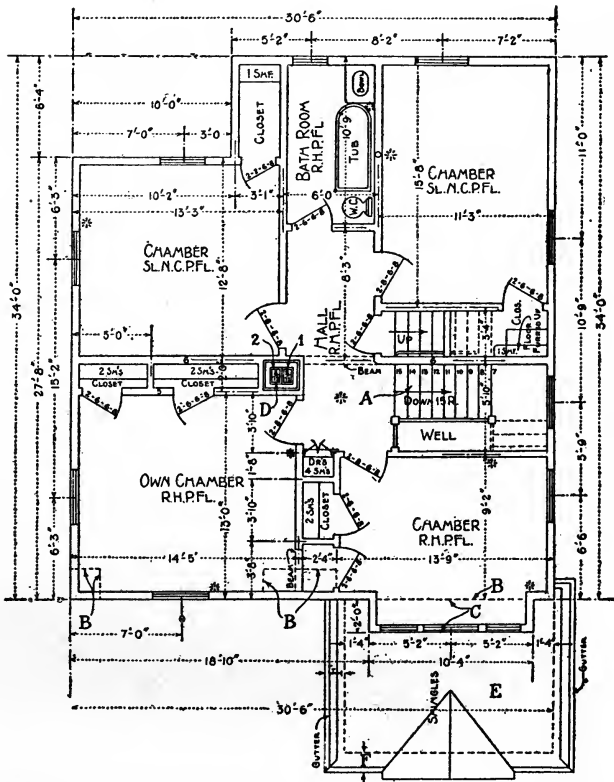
SECOND FLOOR PLAN—SCALE  $\frac{1}{12}$  IN. TO THE FOOT
